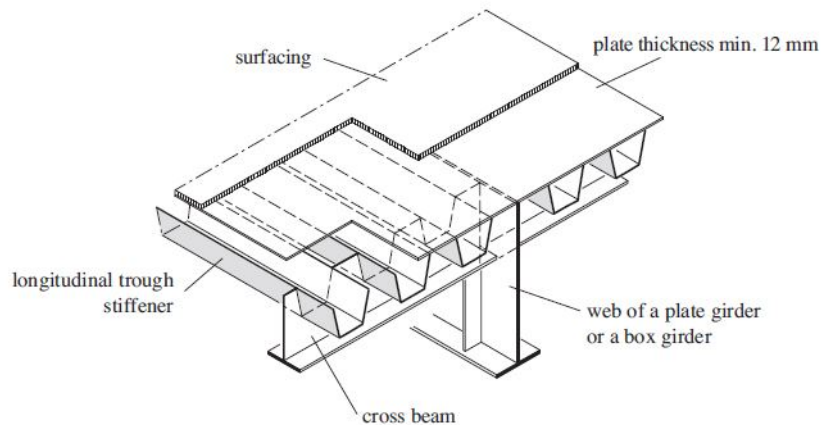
Overview of an orthotropic steel deck: the deck plate is stiffened longitudinally by troughs and transversally by cross beams [17]
